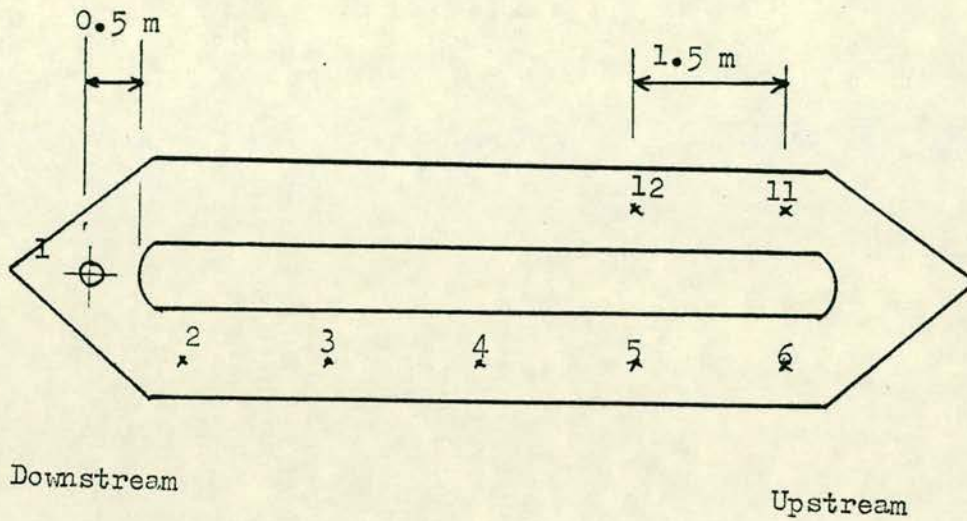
Victoria Bridge - Caputh - plan South pier, location of test points for vertical measurement
